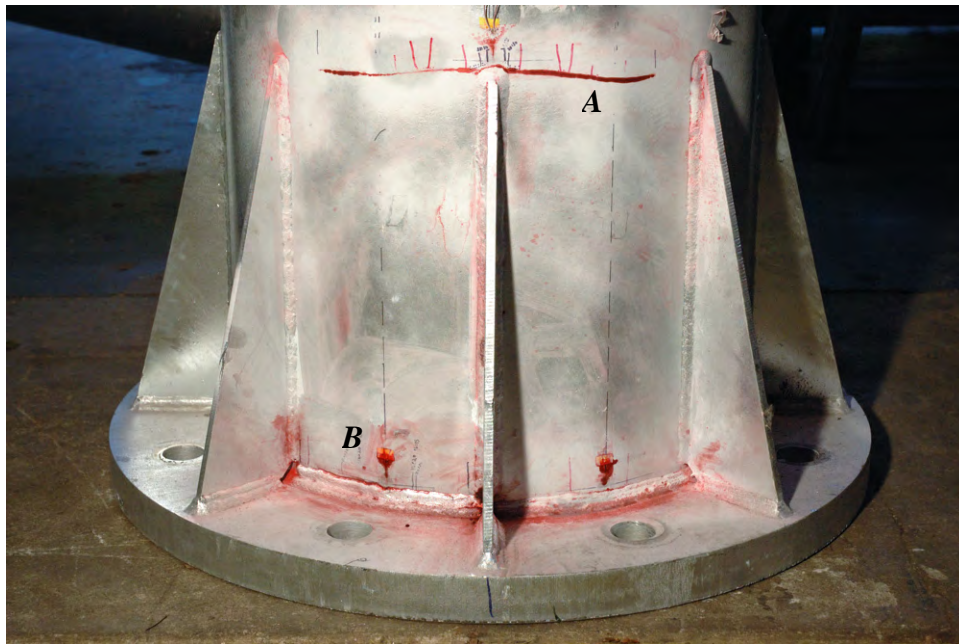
Fatigue cracking in specimen XII-8 – A: from the stiffener to tube weld toe at the termination of the stiffener on the tube wall; and B: from the socket weld toe on the tube wall at the base
